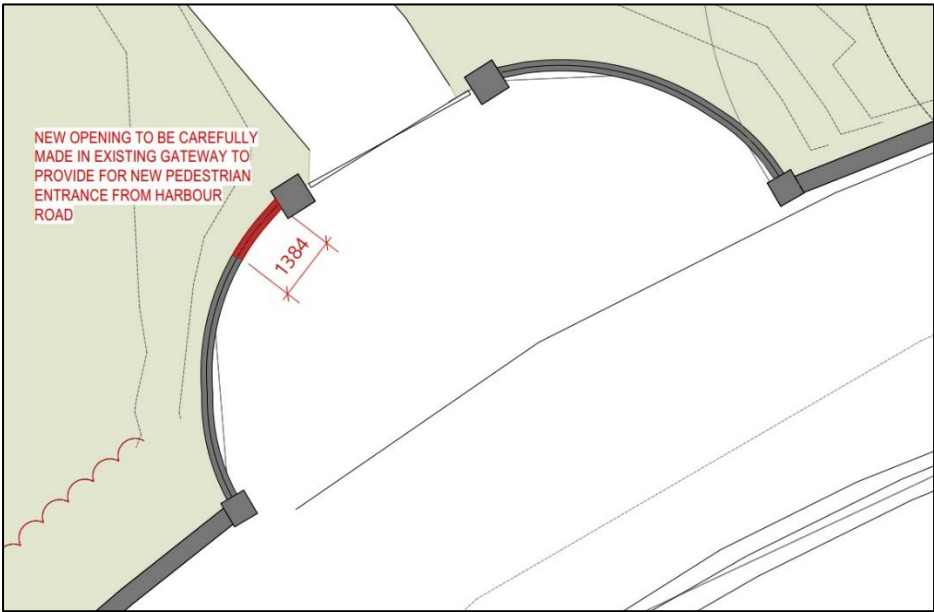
Layout Plan of Proposed Old Rectory Interpretive Centre New Pedestrian Entrance at Existing Entrance Junction
